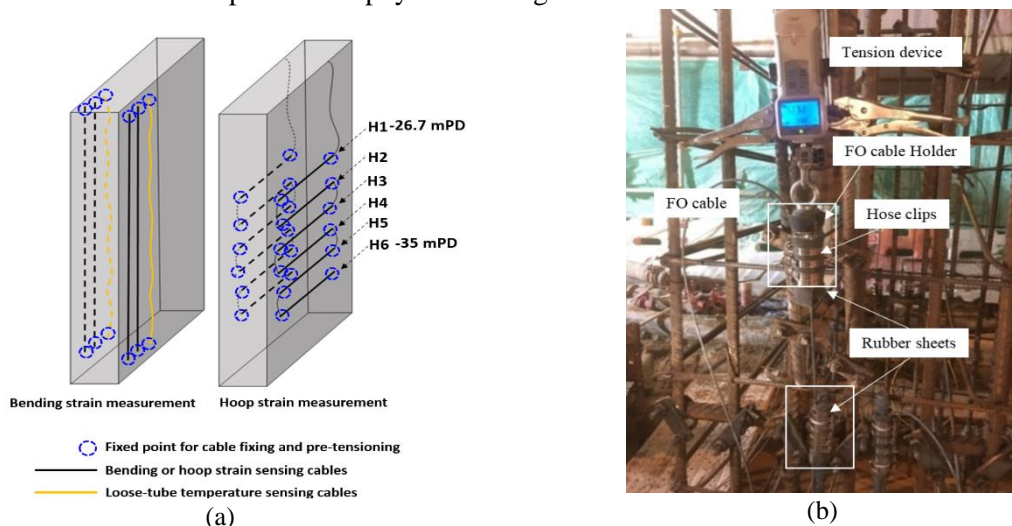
(a) Typical arrangement of fibre optic cables and (b) fixing details of fibre optic cables on reinforcement cages
